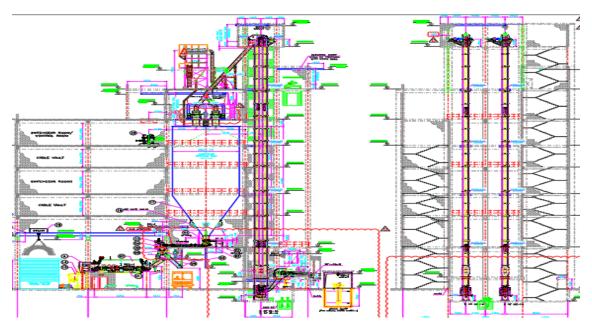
Elevation Details of Mill Building with Silo Storage
